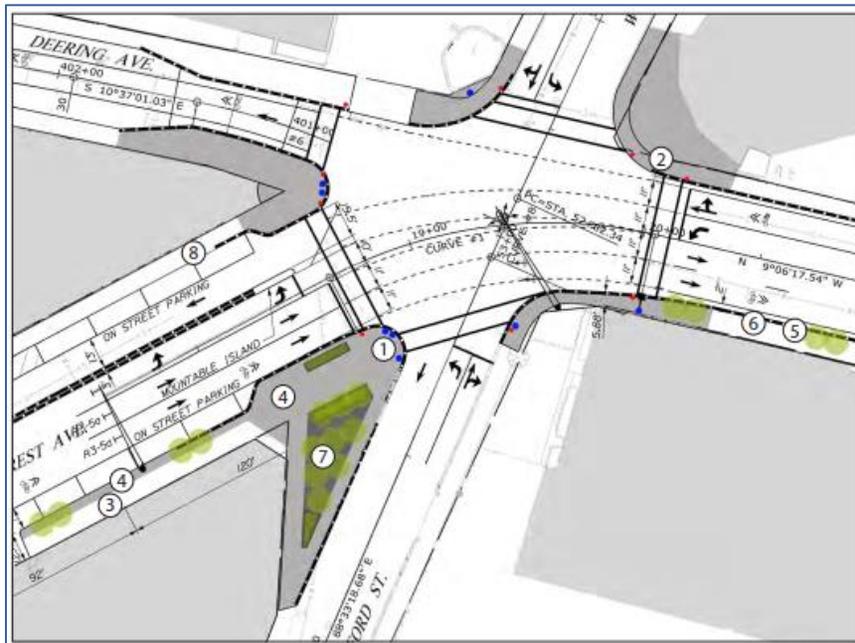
Woodfords Corner Improvement Project, with New Plaza at Forest Avenue/Woodford Street
